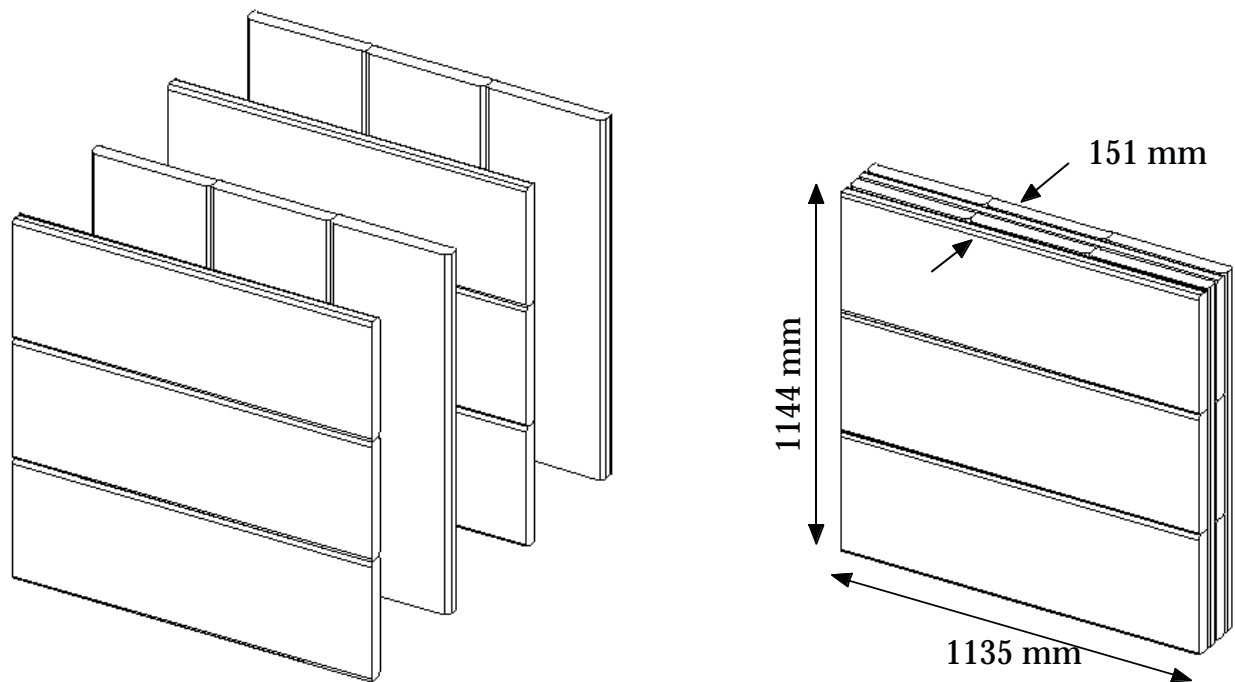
Specimen L60, a quadruple layer built-up lumber specimen consisting of twelve “2x12” studs. Both dry and wet specimens were tested.
